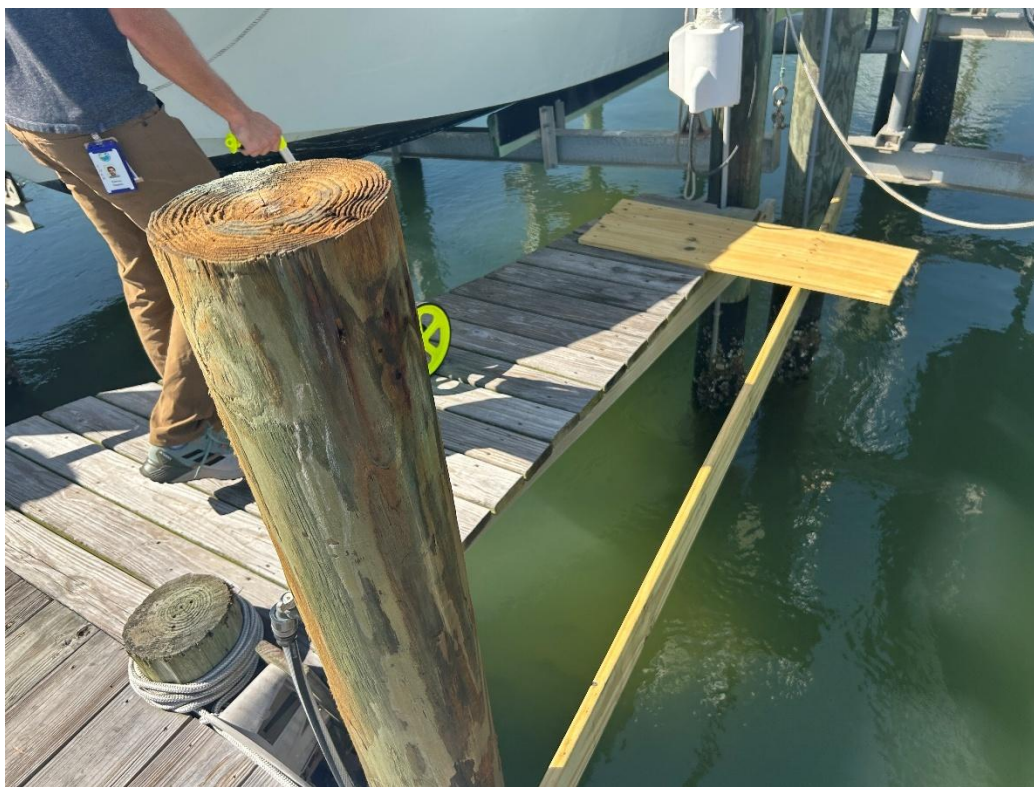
Small finger pier, southeastern portion of main dock, facing south.
